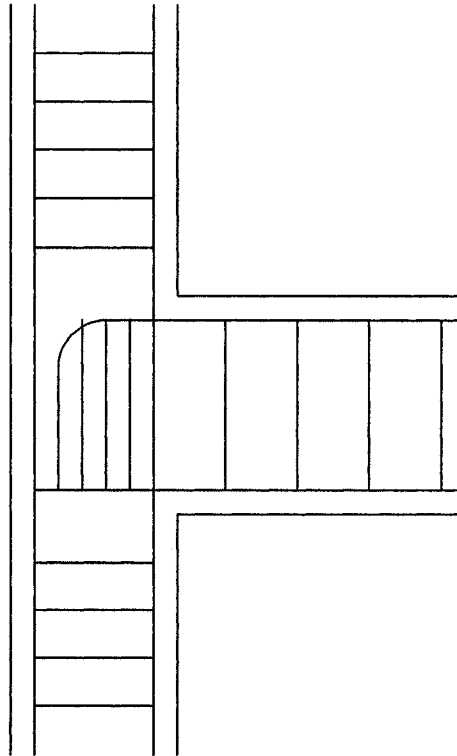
Corner Beam-Column Connection Vertical Stirrups
